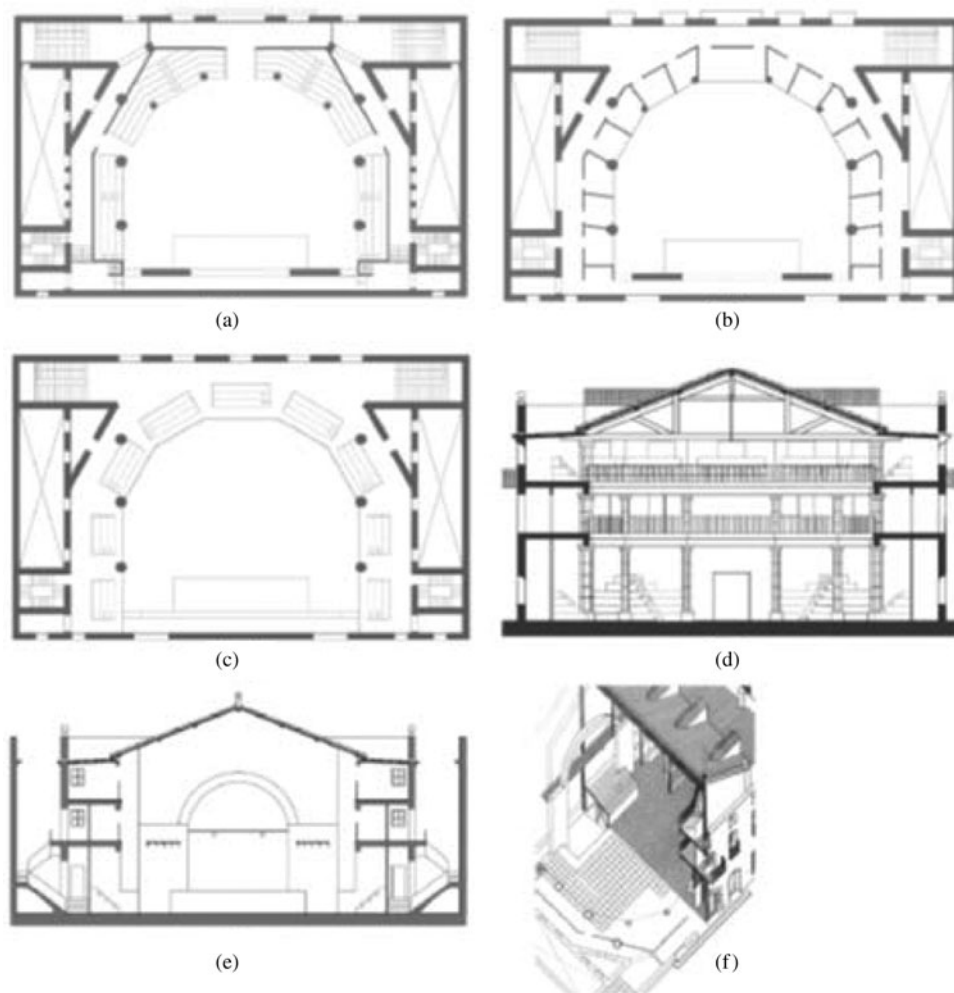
Plans of the Olivera theatre by Ros Andreu (1981): (a) Ground floor, (b) first floor, (c) second floor, (d) façade, (e) section from the façade, and (f) axonometric section towards the stage.
